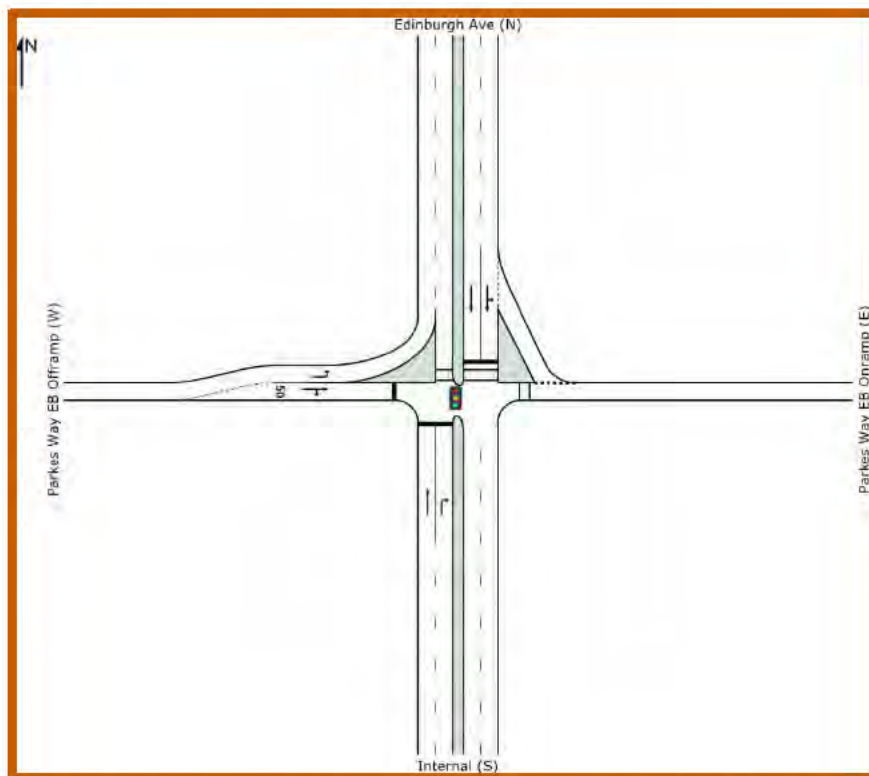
2021 Parkes Way EB – Edinburgh Avenue (Northern) (Parkes Way Open Scenario)
